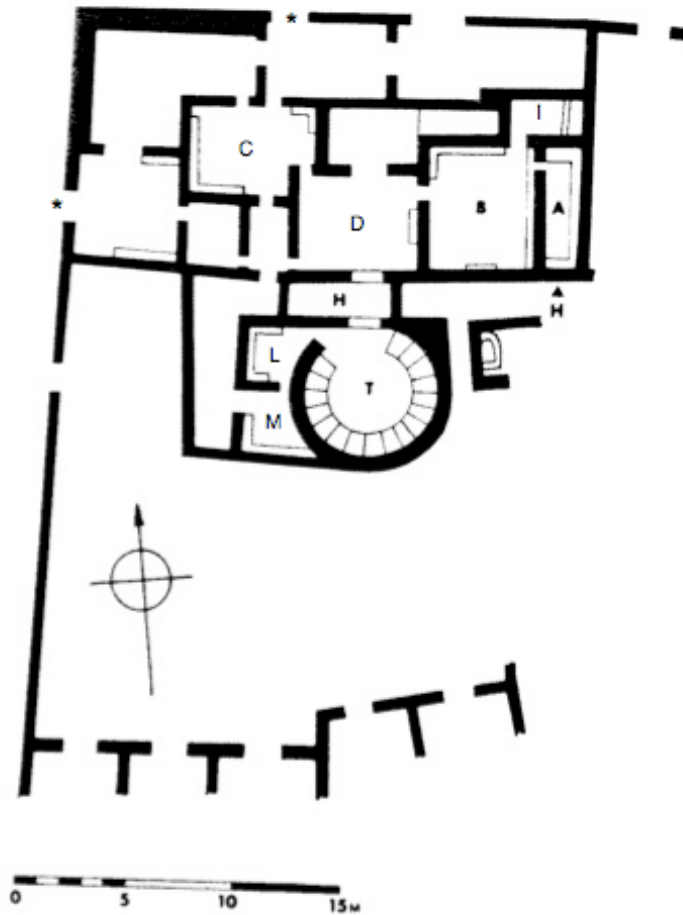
Plan, Public Baths, Megara Hyblaea
